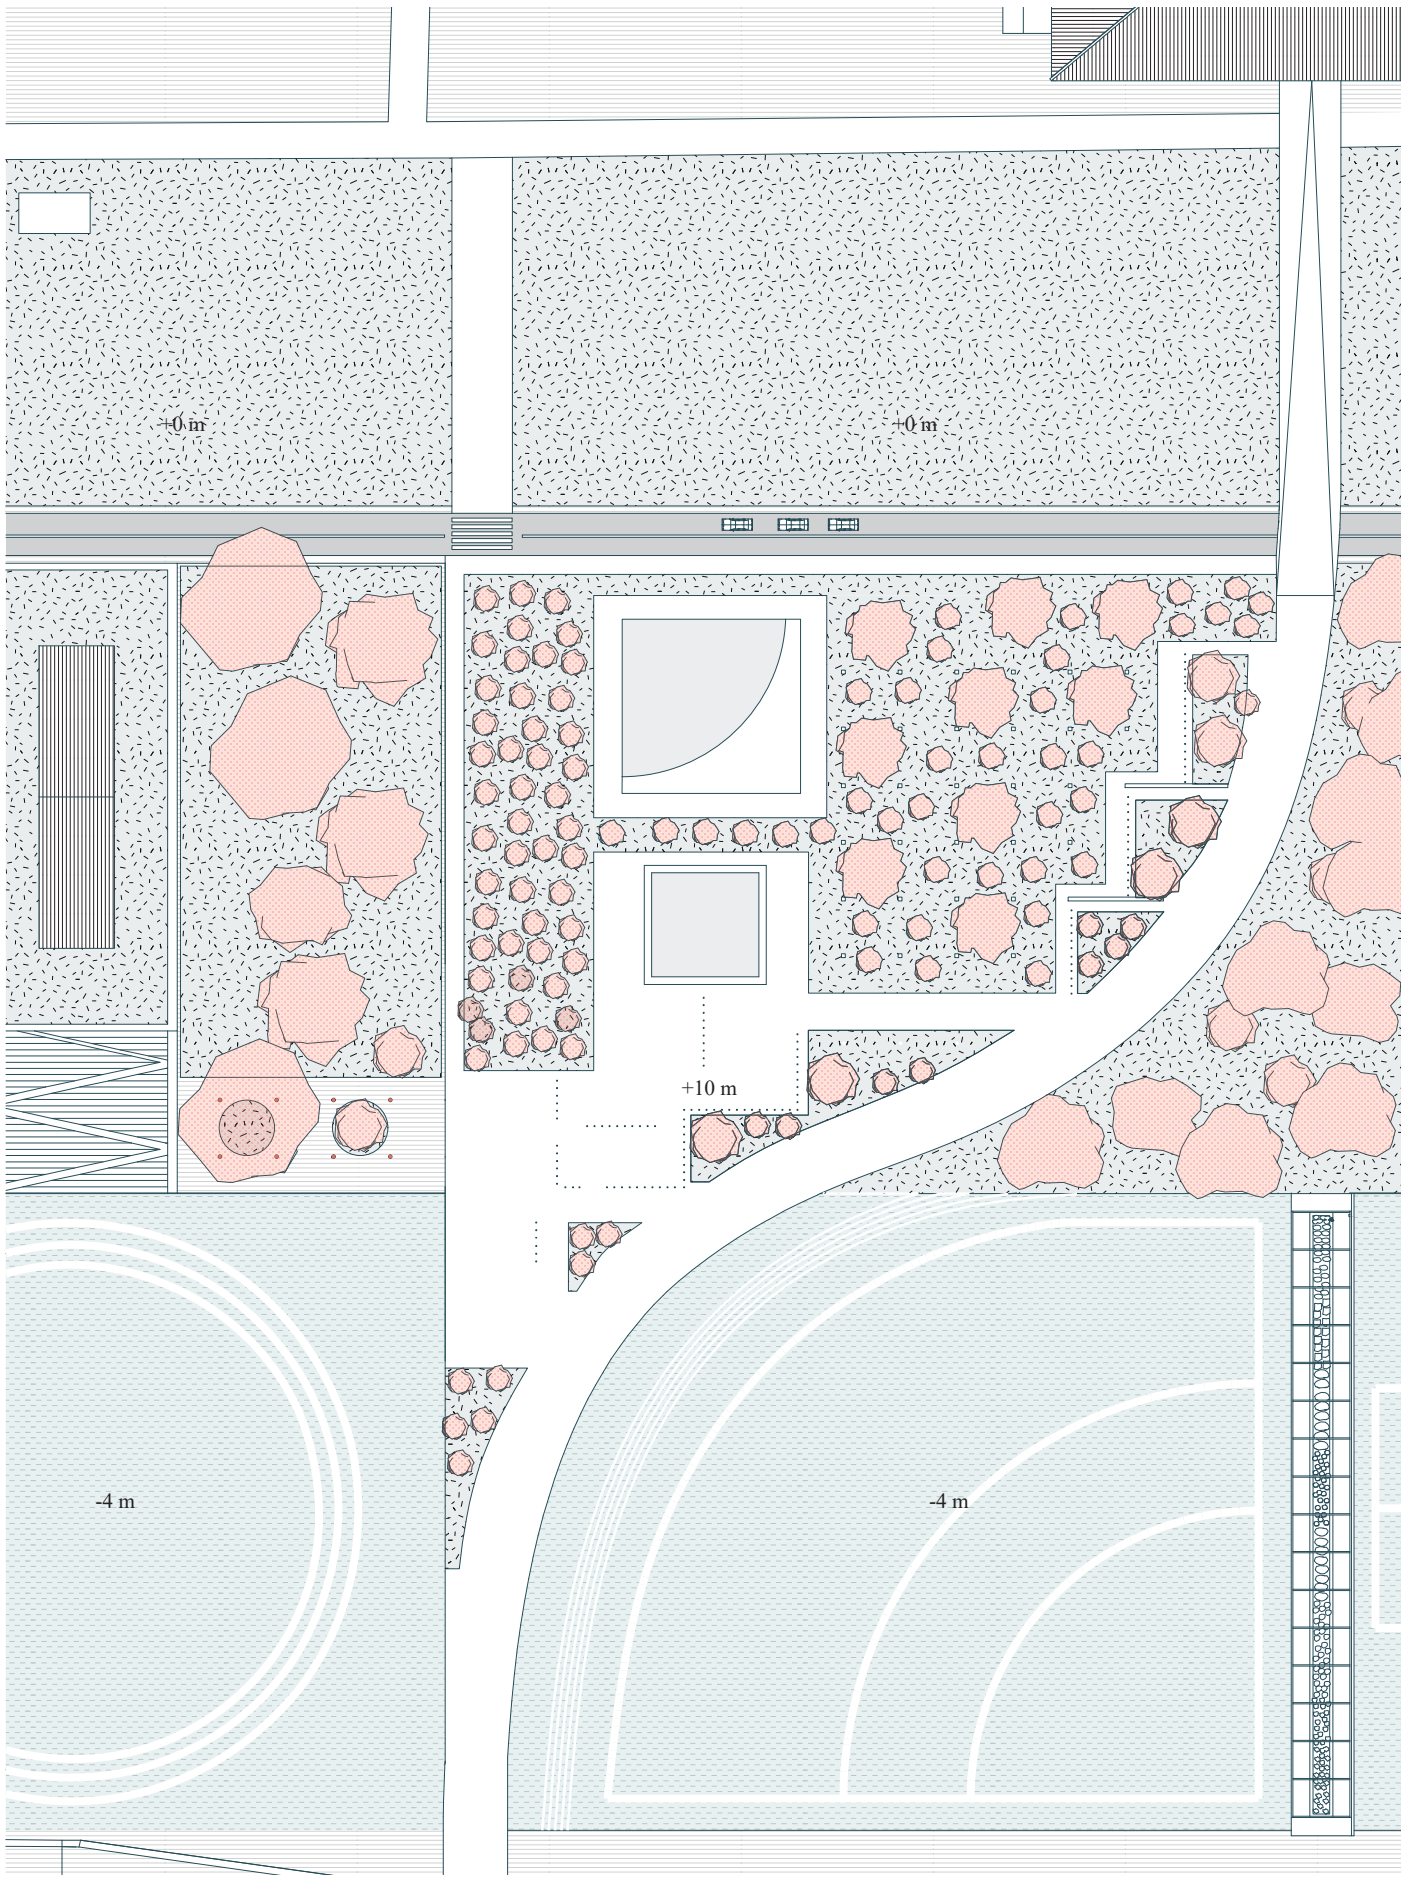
Roof plan of Xi'an Museum. Source: Miriana Leo
